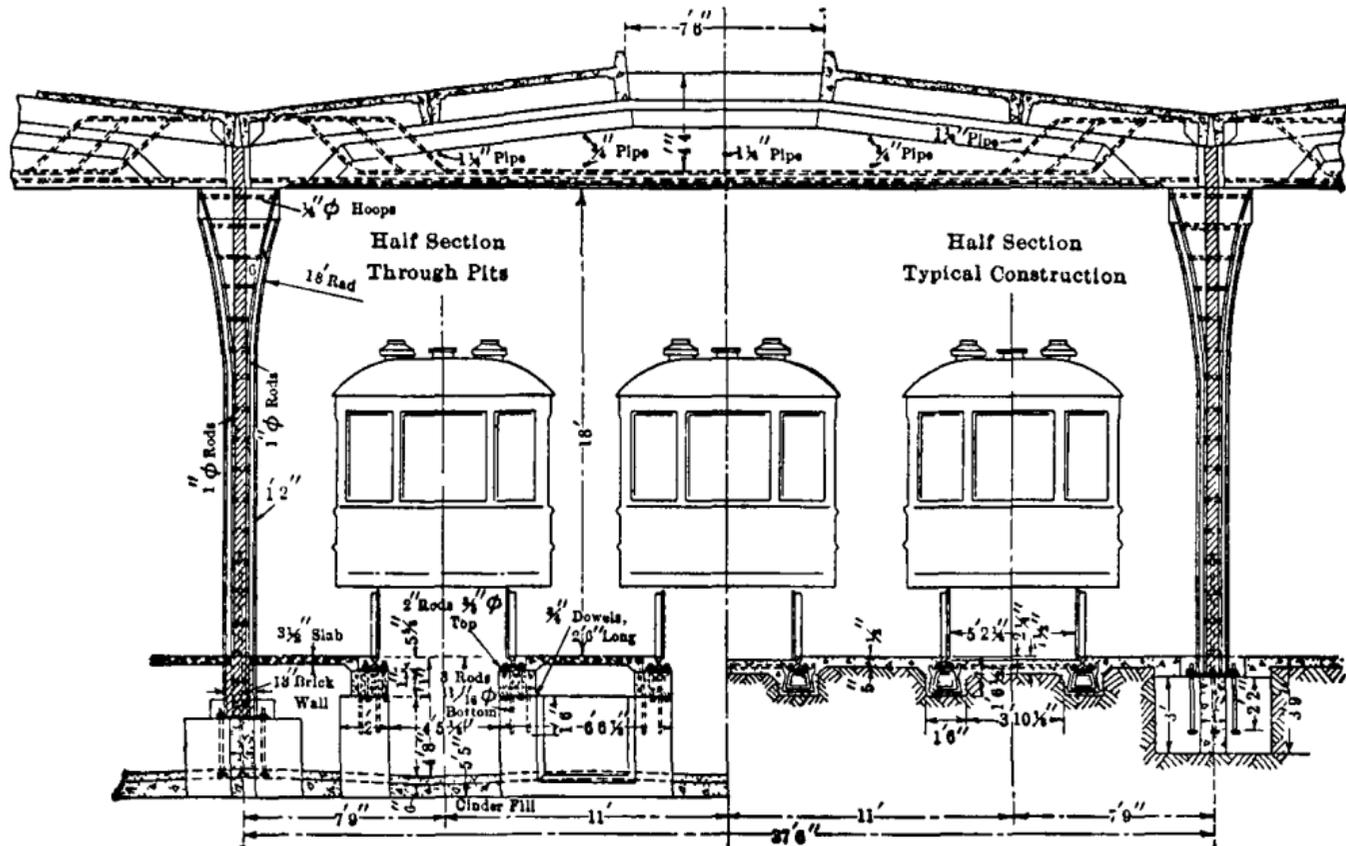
Luzerne car house, Philadelphia. Pit section and flush section of inspection bays.
